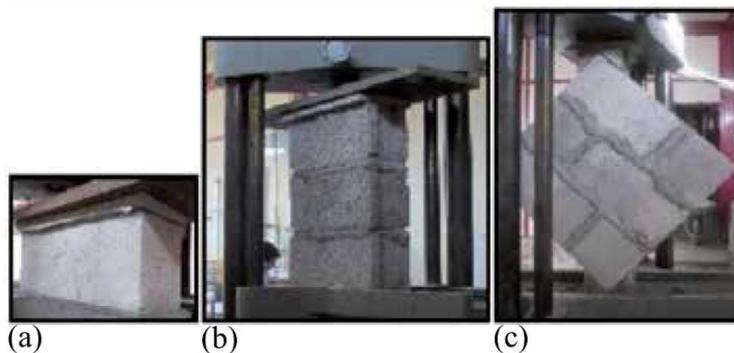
Arrangement of concrete block masonry specimens in the test press: (a) masonry unit, (b) masonry prism and (c) masonry wall.
